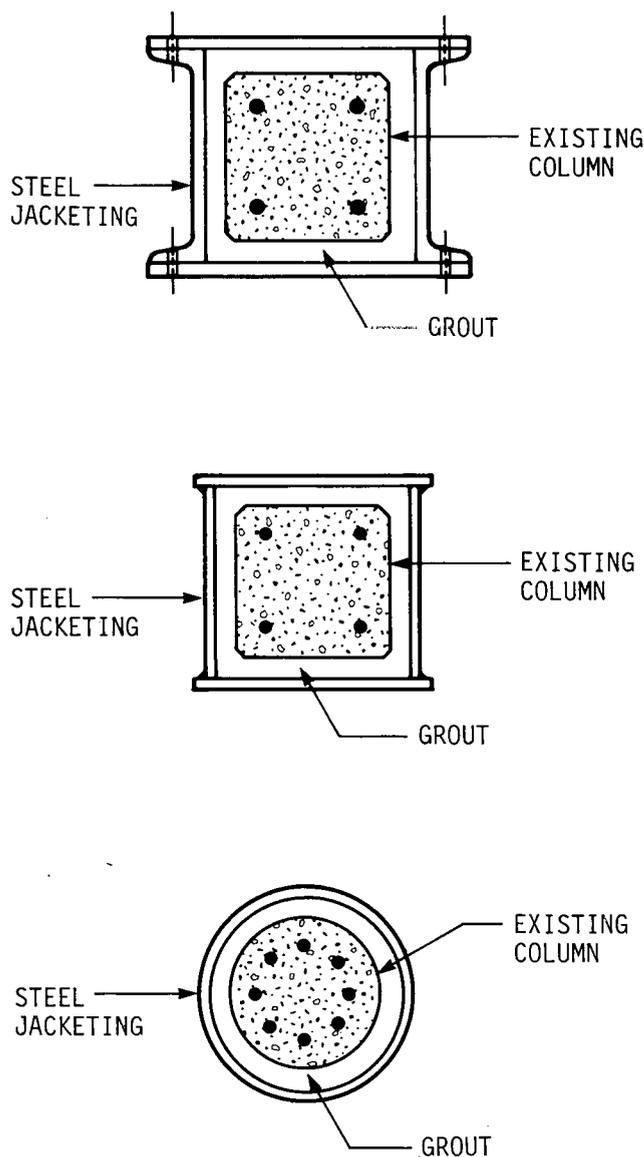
Cross-sectional view illustrating jacketing of concrete columns with steel shapes.
